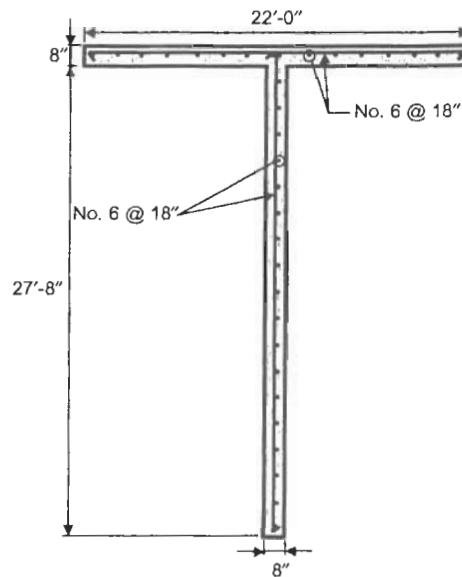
Reinforcement Details for Shear Wall Along Line 5 (SDC D)
